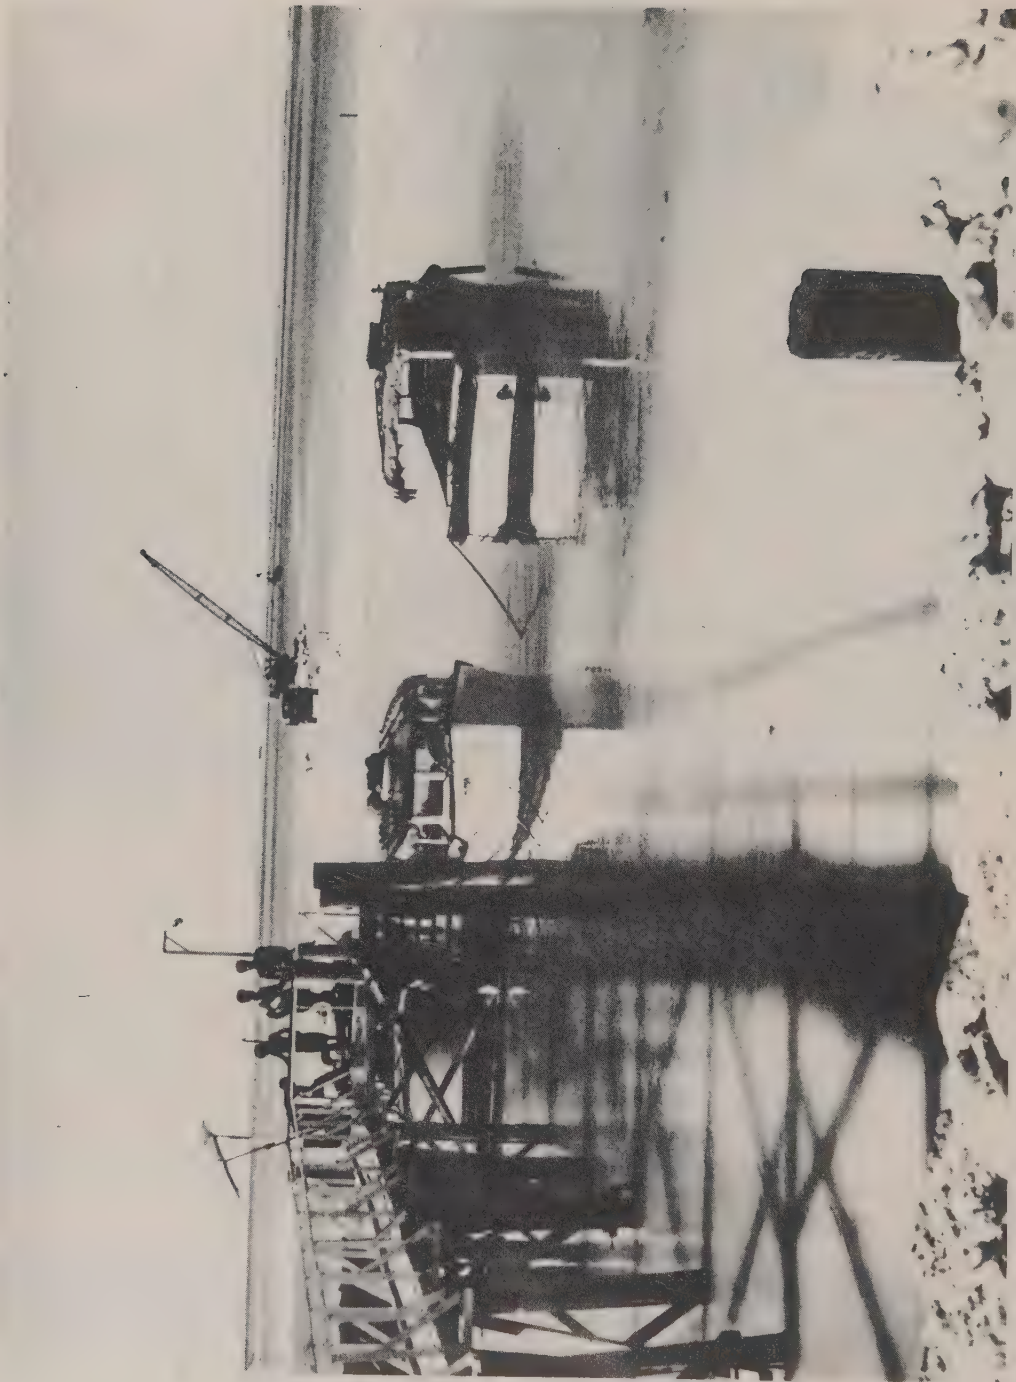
Boat Dock at Bairiki, With Launches Alongside and Dragline Working on Harbor Construction in Background.
